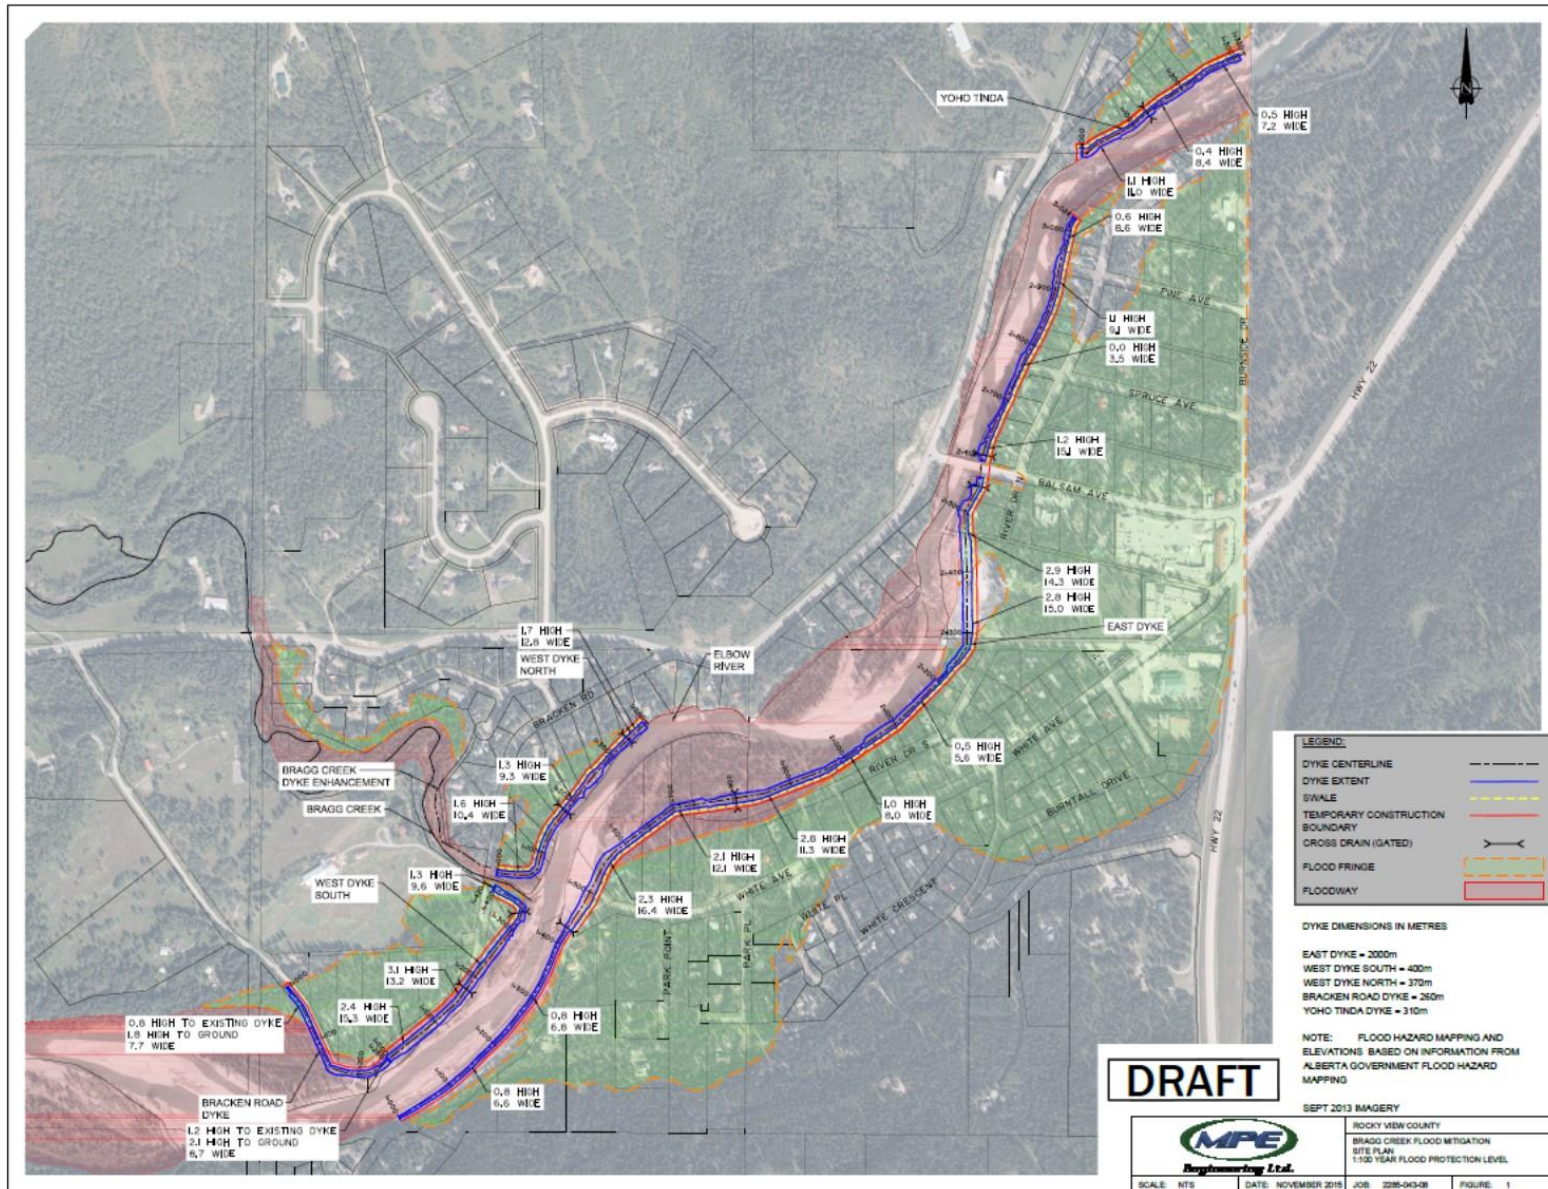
Preliminary Dike Locations adapted from MPE Engineering Ltd. Report (2015)
